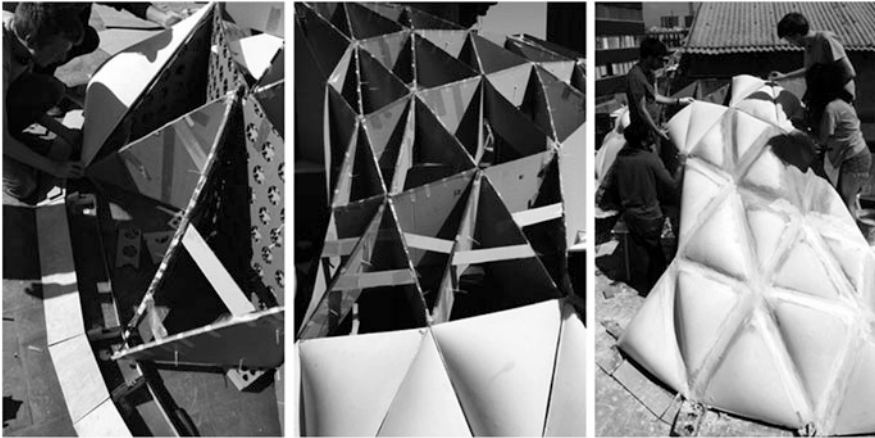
Construction: use of cardboard scaffolding to position and support fabric-formed precast panels prior to joining (Maxwell 2013)
